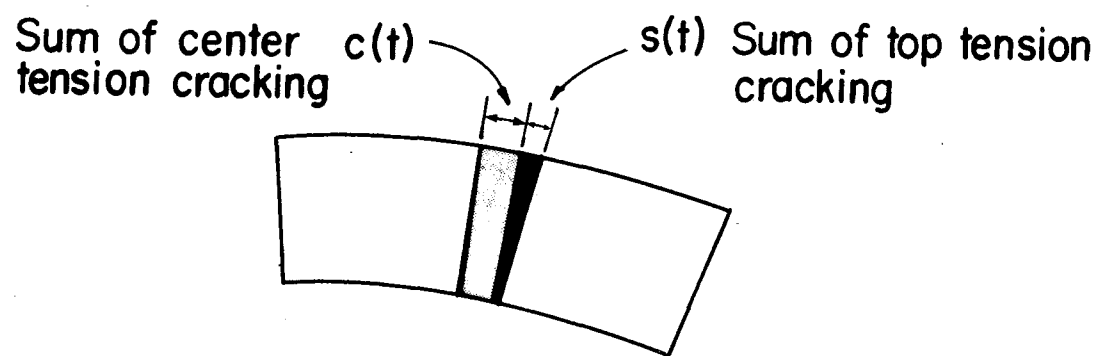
Analysis of Crack Patterns on the Distorted Wall
